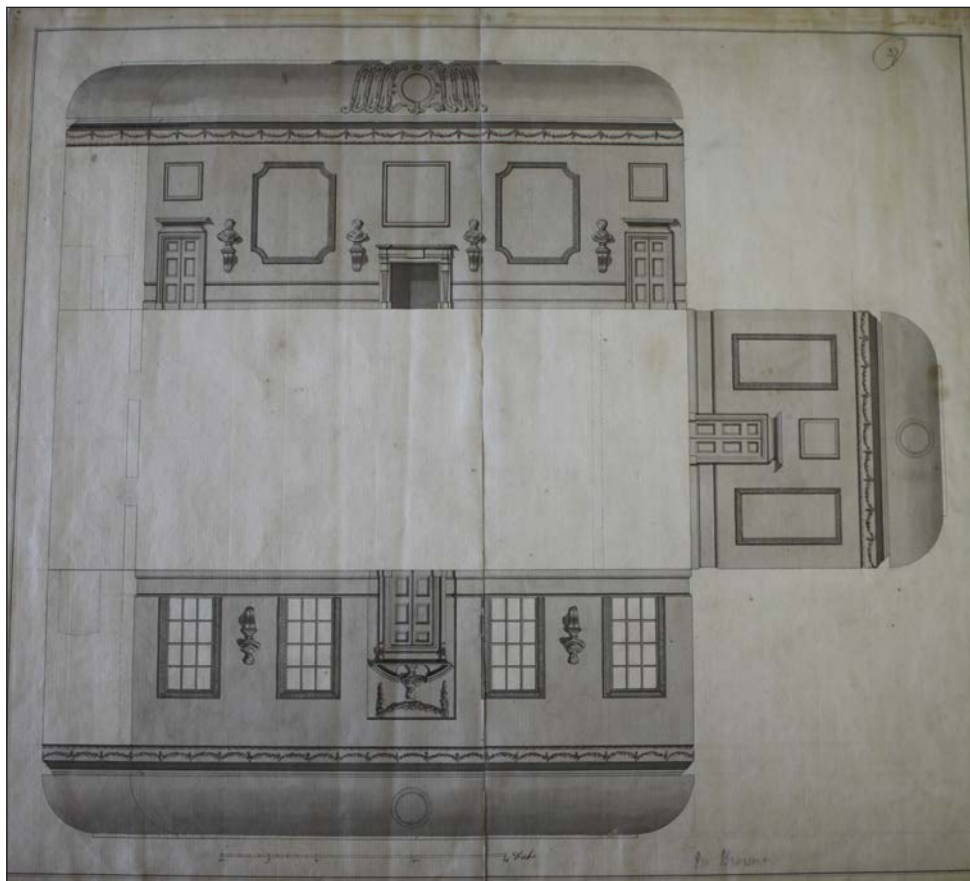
The Great Hall design, laid-out elevations, Burton Constable Hall, East Yorkshire, 1760 (Burton Constable Foundation Collection LDS 1615)
